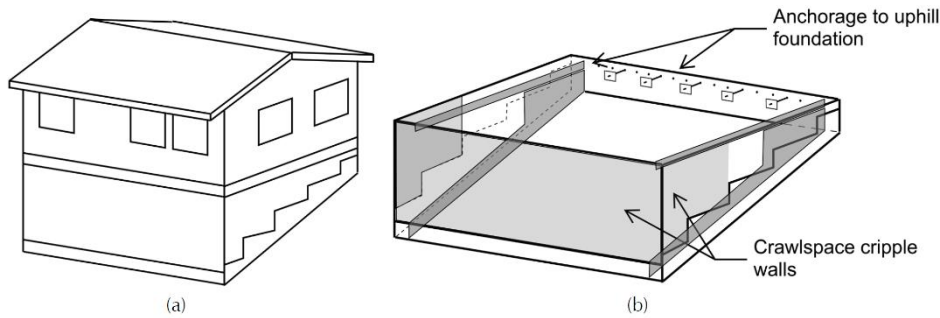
Schematic of a downslope hillside house (a) and detail of the foundation (b). [1]
